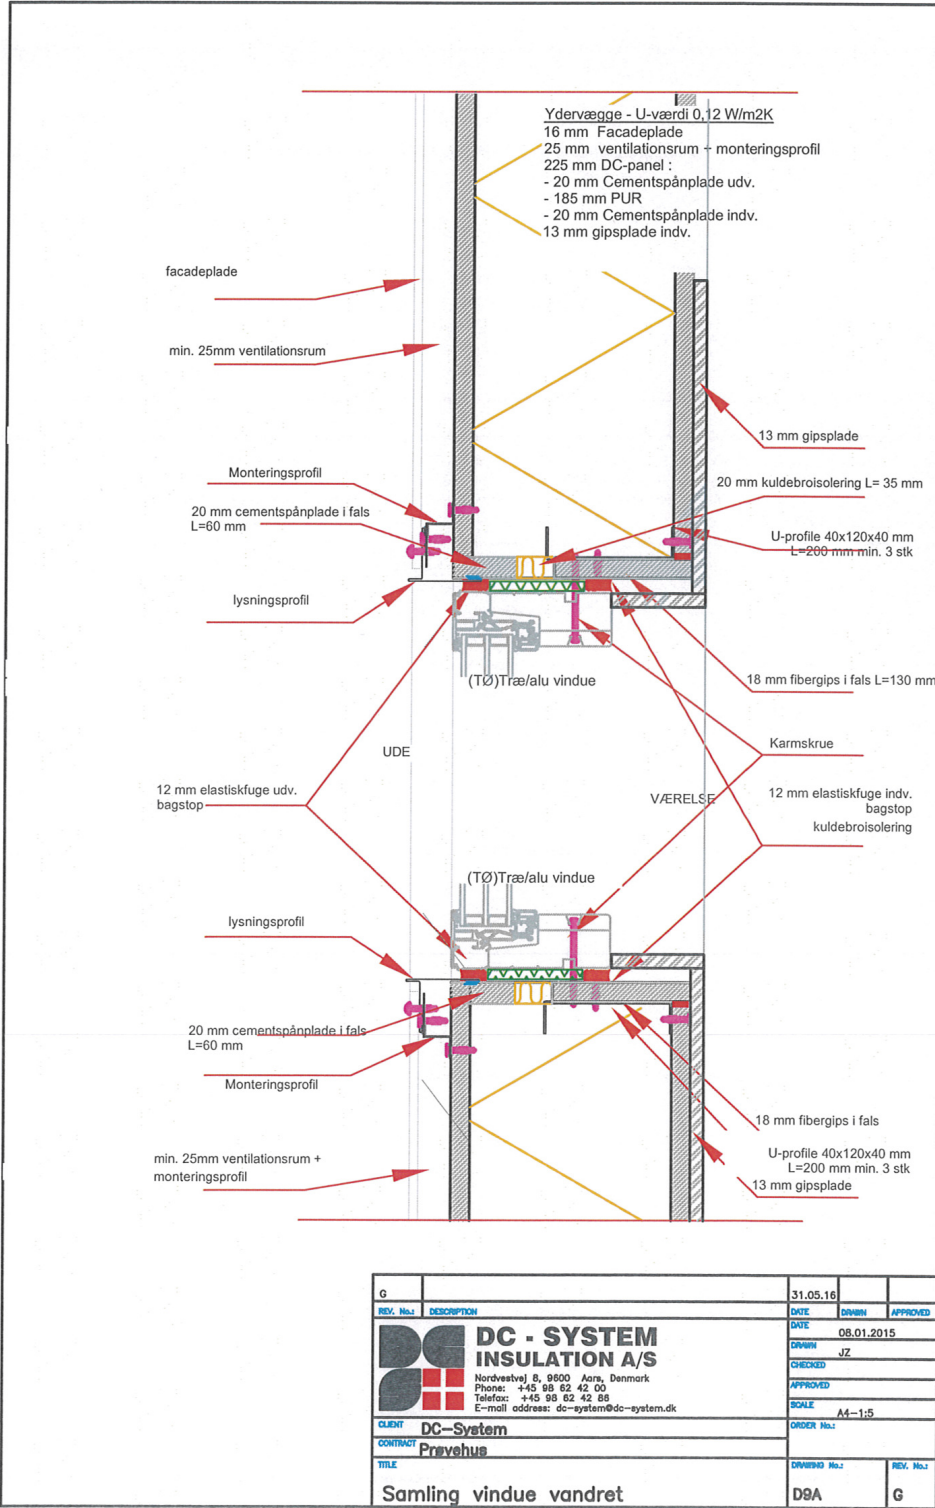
Detail: Wall-window. [DC-System, Test House (2015)]
